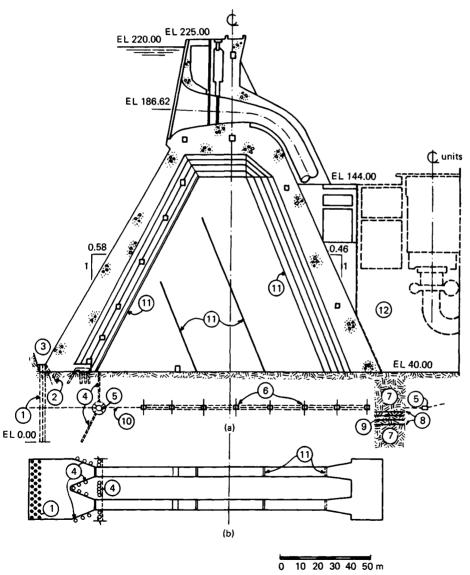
Itaipu dam: double buttress monolith of hollow gravity section in river channel. (a) Section; (b) plan, where (1) is the grout curtain, (2) contact grouting, (3) consolidation and contact grouting, (4) drainage holes, (5) drainage tunnel, (6) shear keys, (7) dense basalt, (8) breccia, (9) vescicular amygdaloidal basalt, (10) discontinuities, (11) contraction joints, and (12) is the powerhouse
